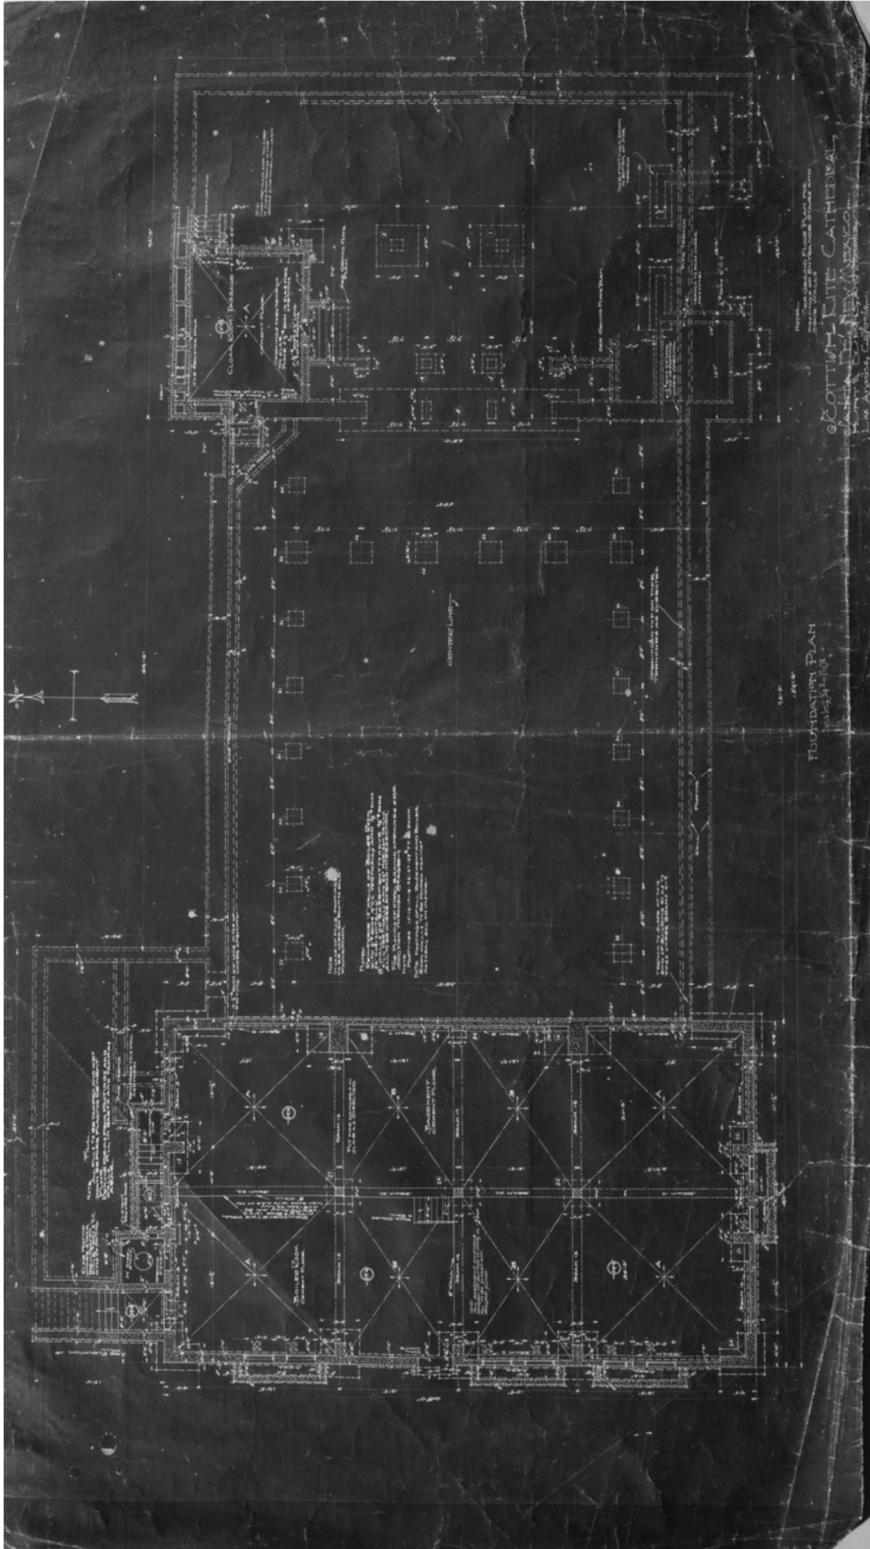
Historic drawing: foundation plan; Hunt and Burns, Architects, June, 1911.
